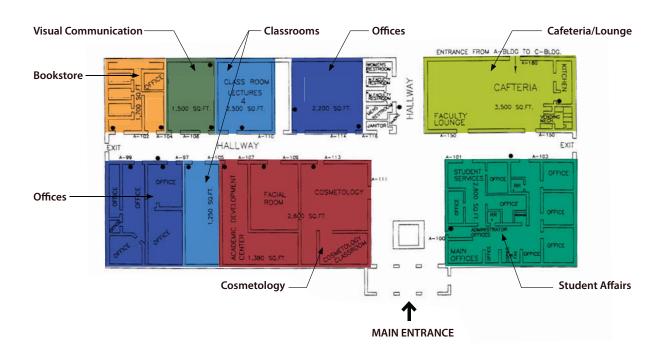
Floor Plans Indicating Department Locations in the Urban Center
